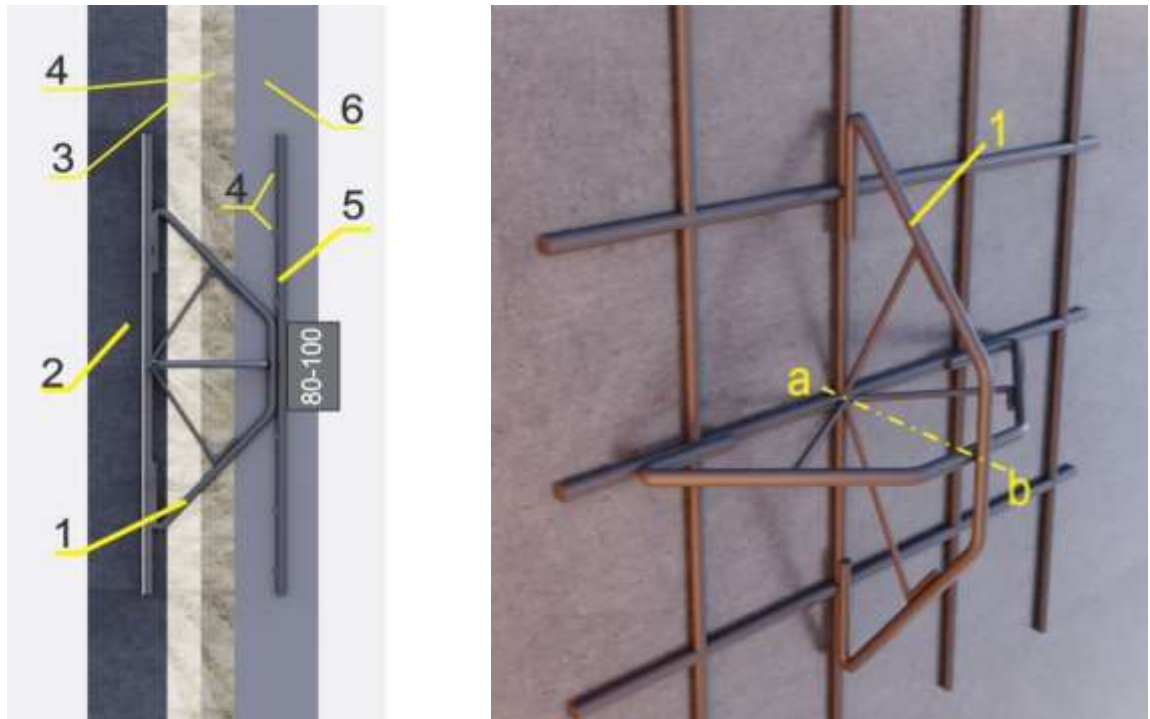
An anchor device that connects the layers when pouring a multi-layer heat-resistant concrete slab.
